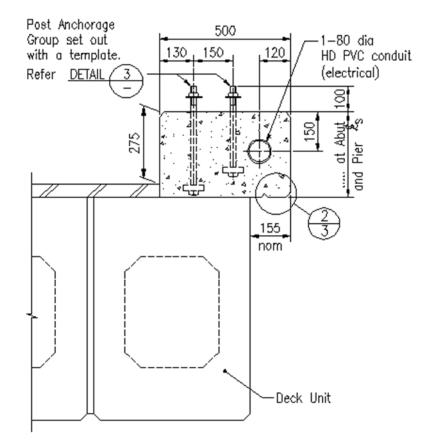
Bridge Traffic Barrier Post Anchorage Setting Out Detail (Regular Performance)
